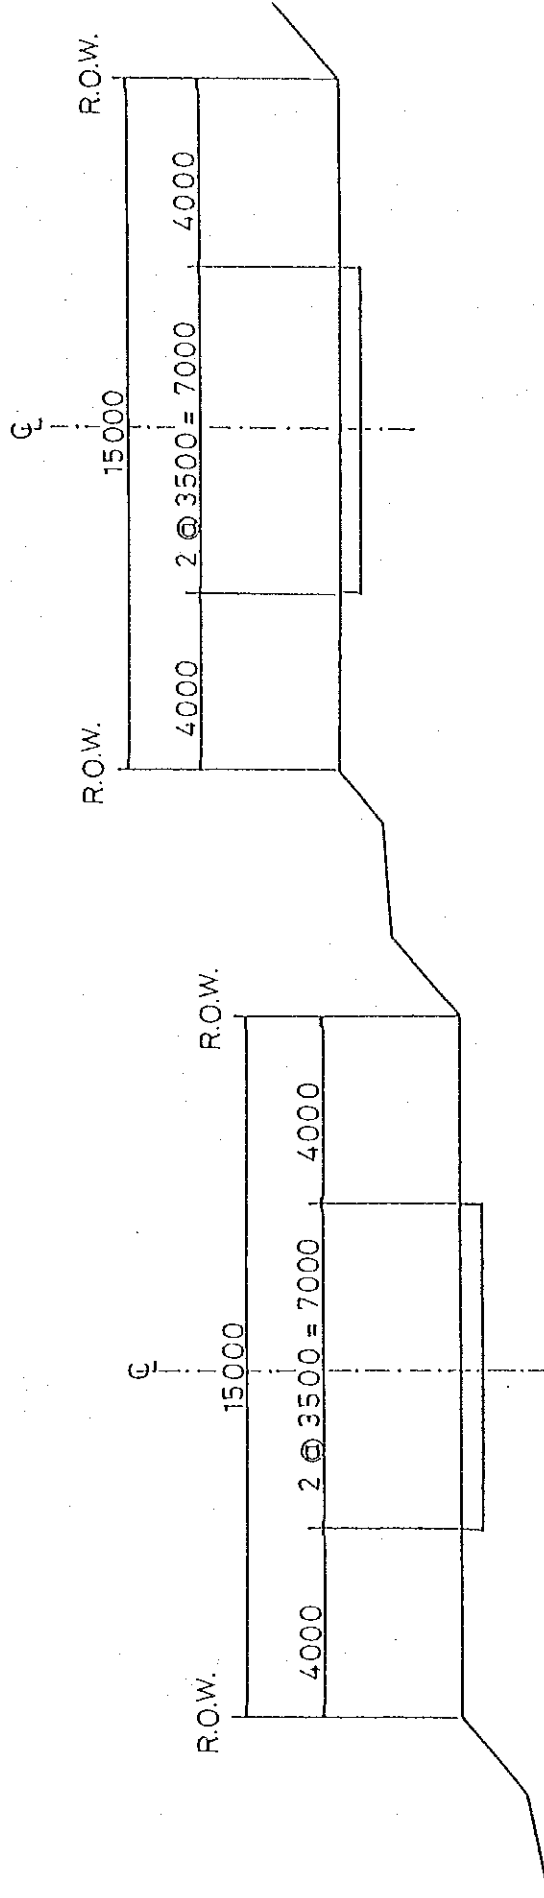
Typical Cross Section - New Road Alternative
